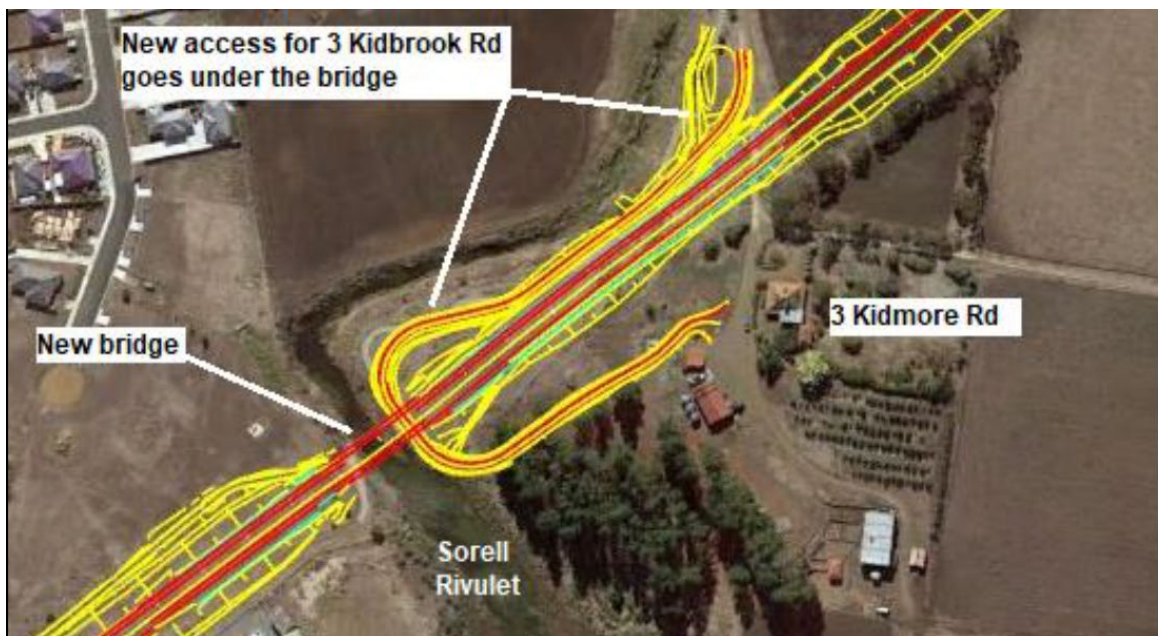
Proposed works include a new bridge across the Sorell Rivulet, new access track to 3 Kidmore Road and a shared path to link to existing trail network. (Source: planning application documentation)
